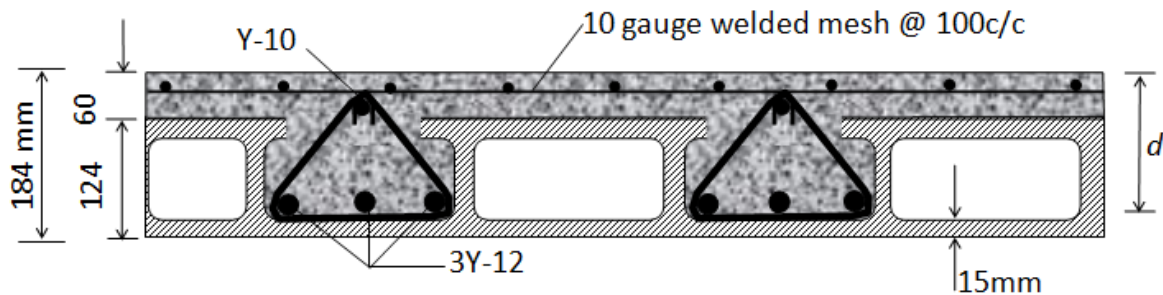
Cross-section of GFRG panel (every 2nd cavity reinforced)
